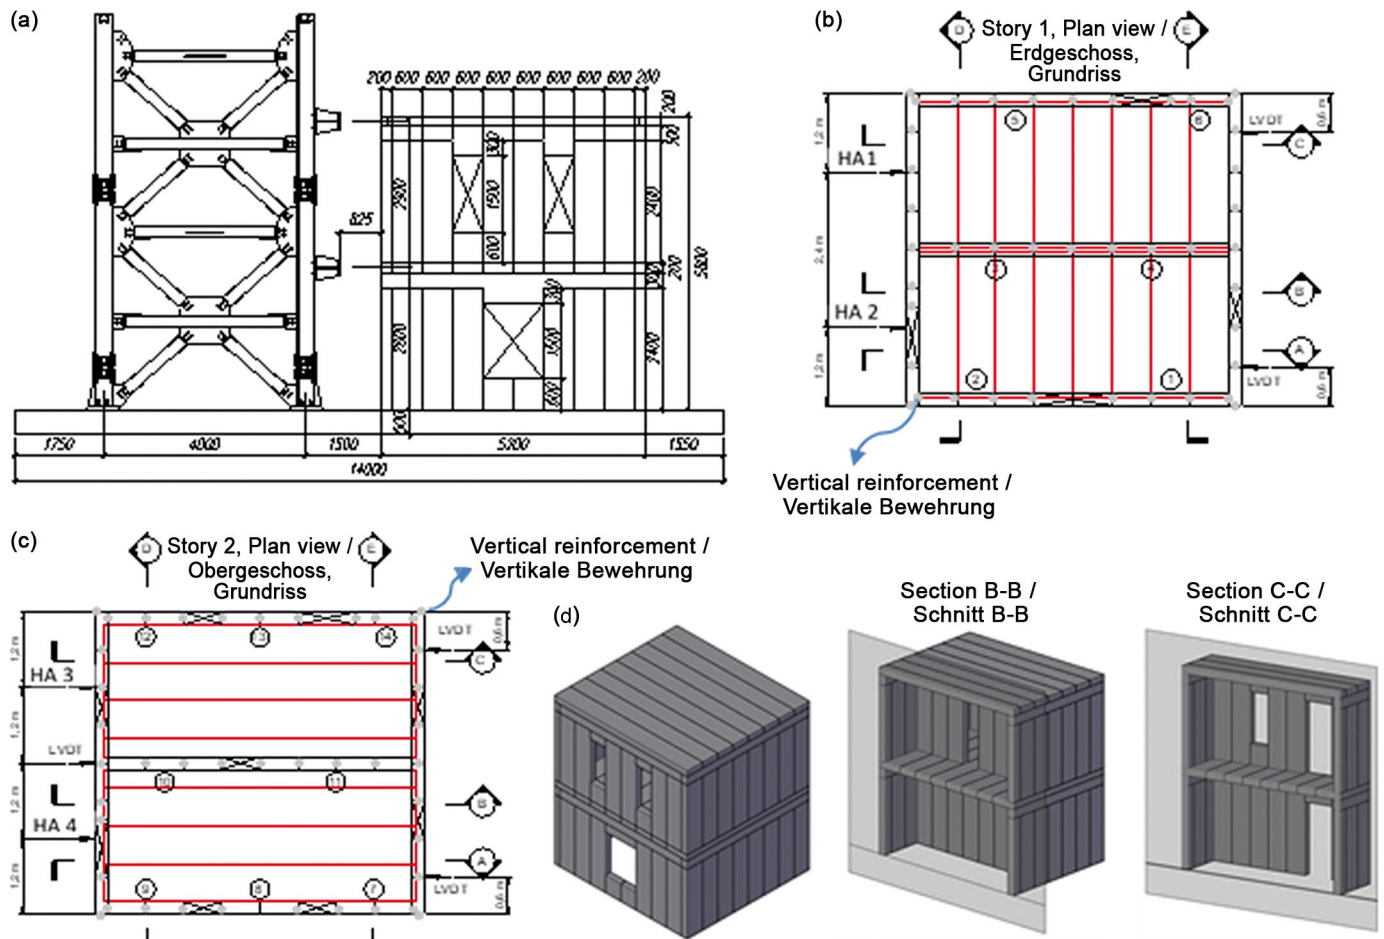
Drawings of (a) the test building and its loading system, (b, c) plan views of stories, and (d) 3D representation of the test building
